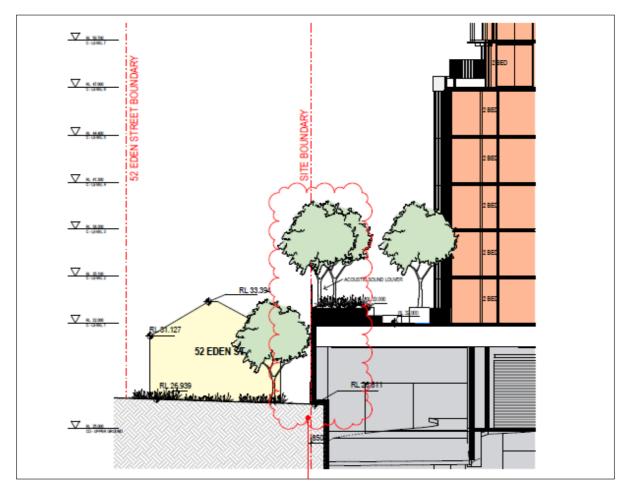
| South-western elevation showing the 1-2 storey party wall to the boundary (Base Source: Applicant's RRFI 5 May 2022)
